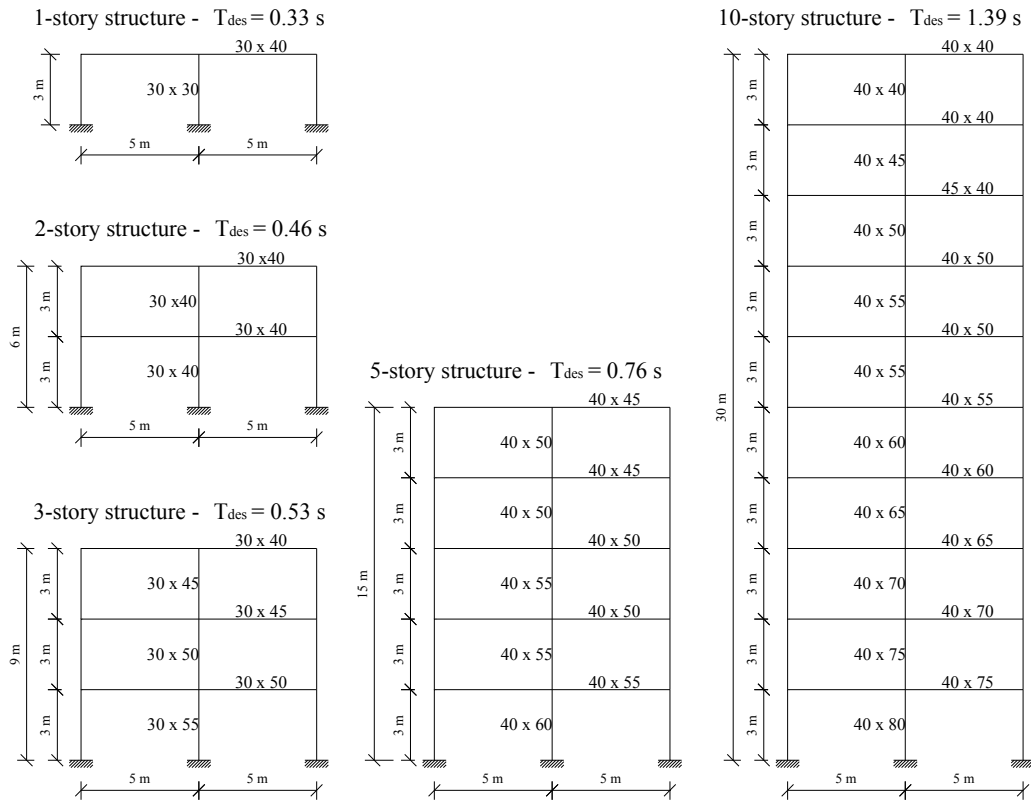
Lateral view of the considered building models and their design fundamental period (T_{des}). Dimensions of the cross sections are in cm.
